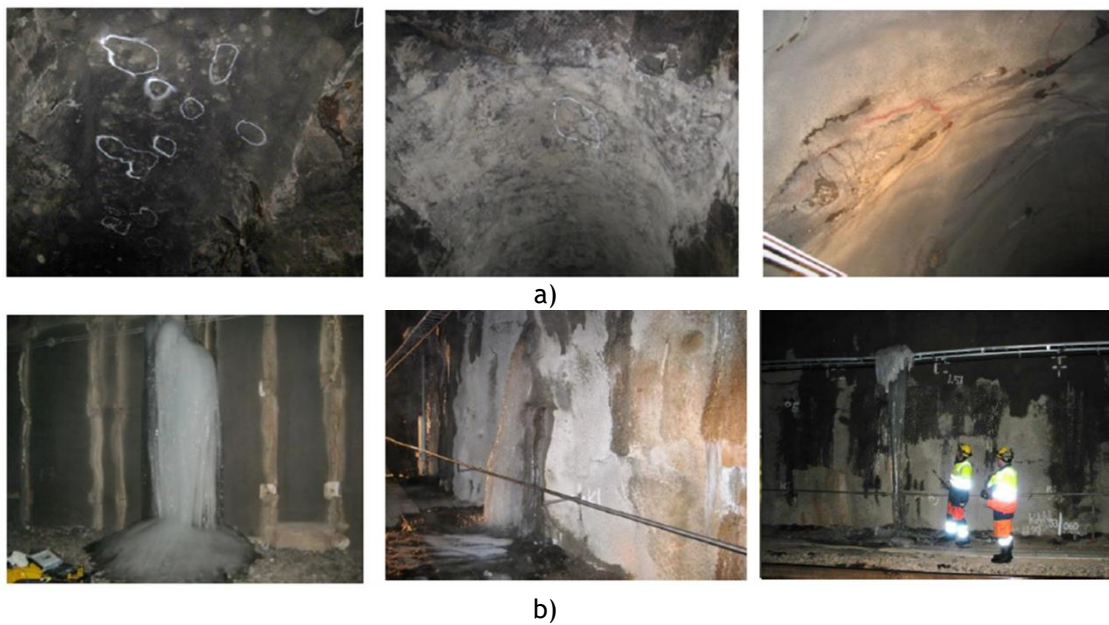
Typical damages in the Finnish railway tunnels; a) cracks on the interior wall surface and b) water intrusion leads to freezing in cold areas [31].
